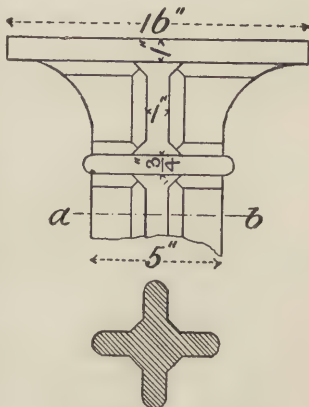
gives a horizontal section and elevation of the head of a stanchion suitable for carrying the girder in fig. 267.
